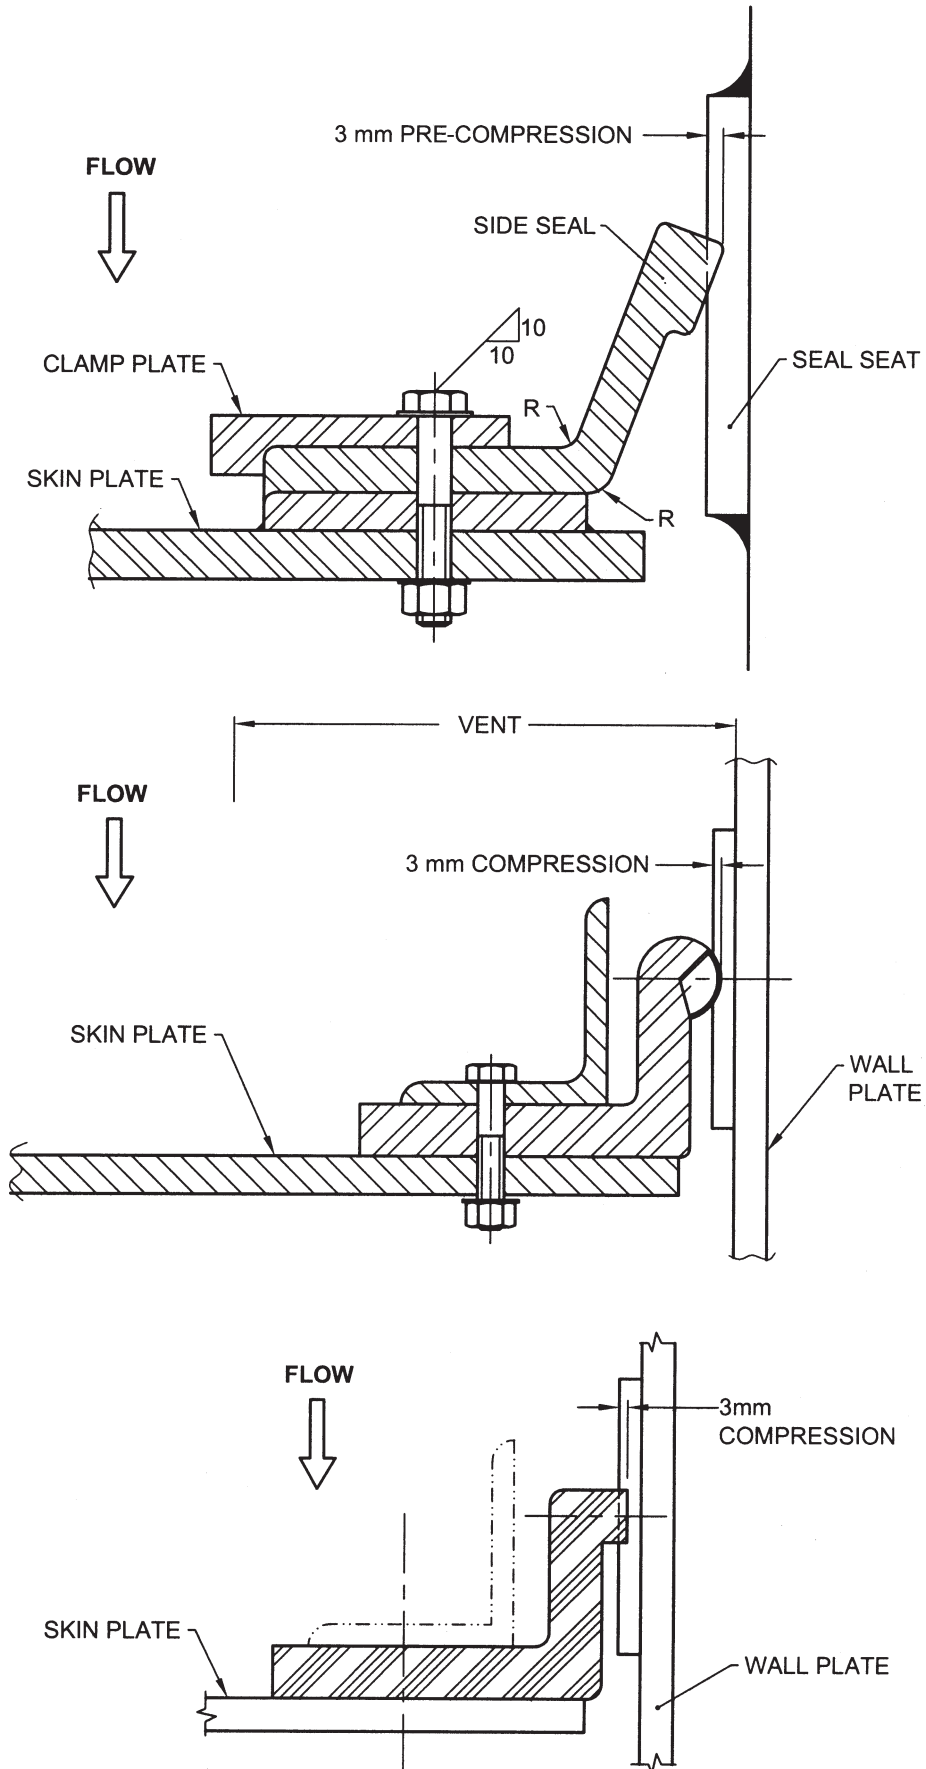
ASSEMBLY DETAILS WITH ANGEL SHAPED SEAL
